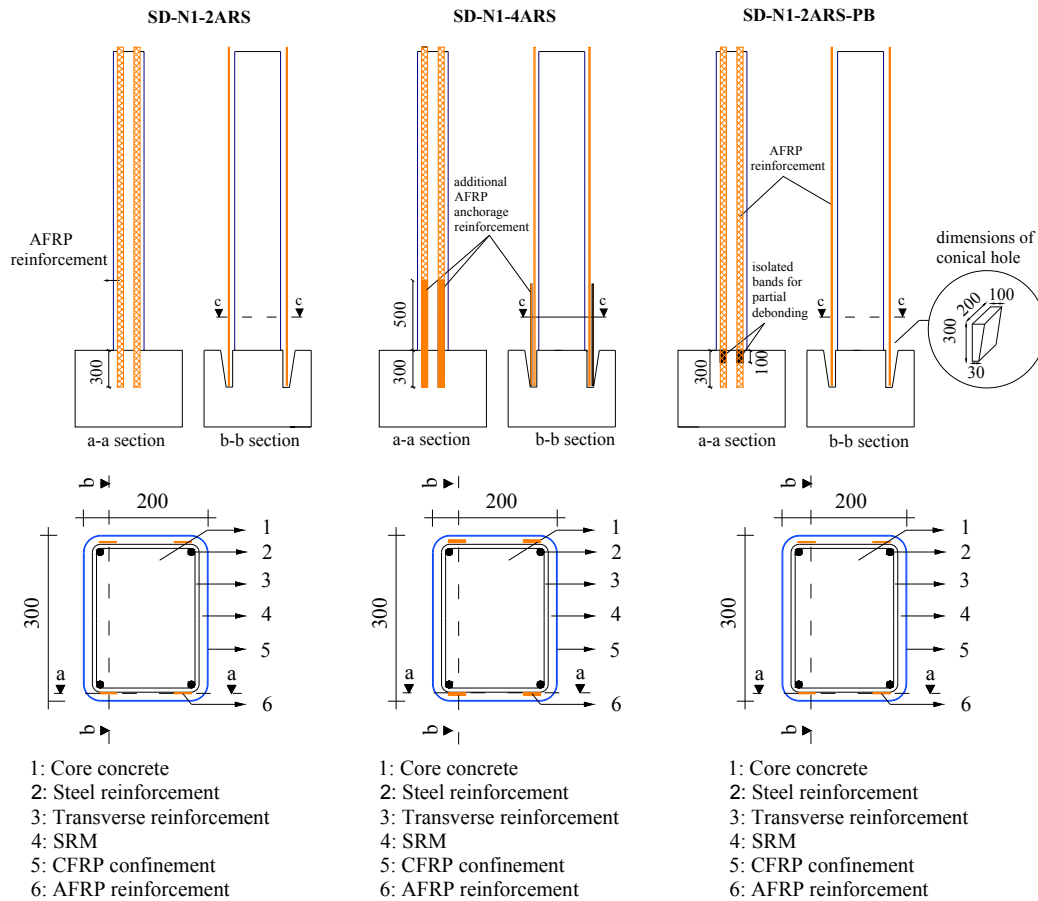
Retrofitting and anchorage details of first group specimens.
